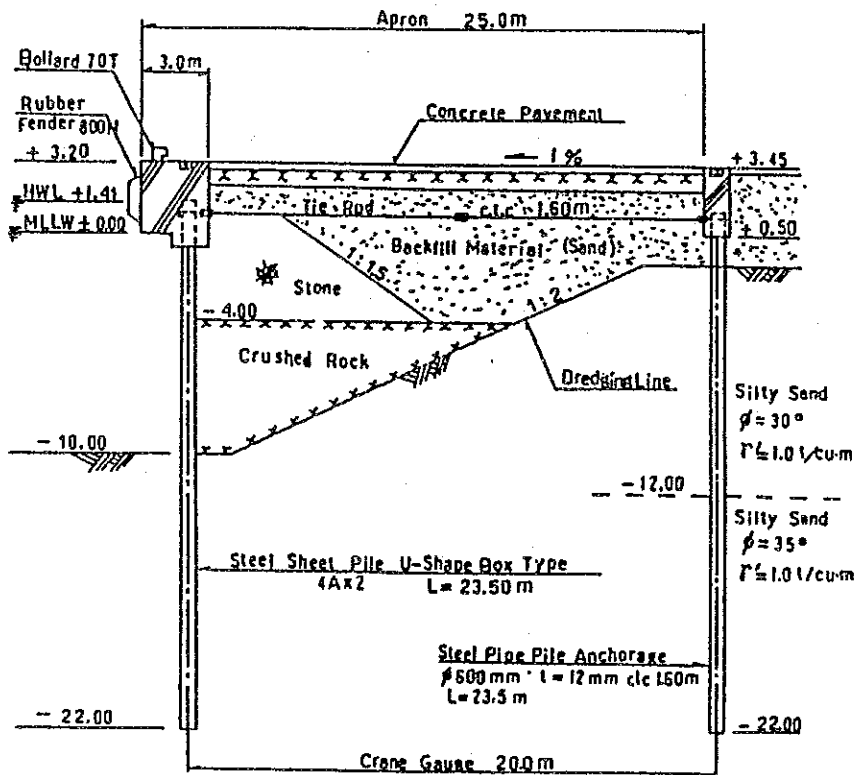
Standard Cross Section of -10m Container Berth
